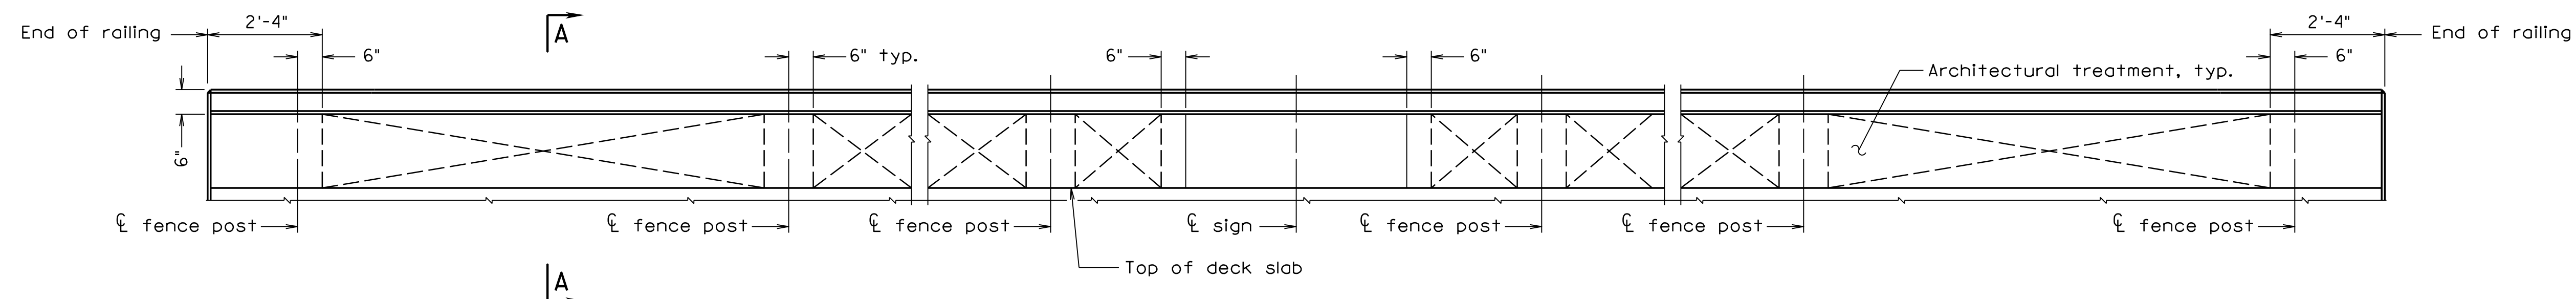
Details shown for a 8'-0" long form liner. Contractor shall submit shop drawings with pattern layout for approval by the Department.
